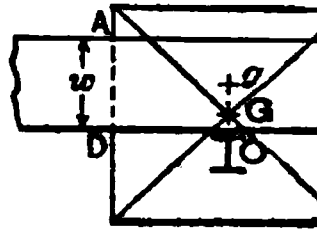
Square Supporting Area. Wall and Eccentric Isolated Load
